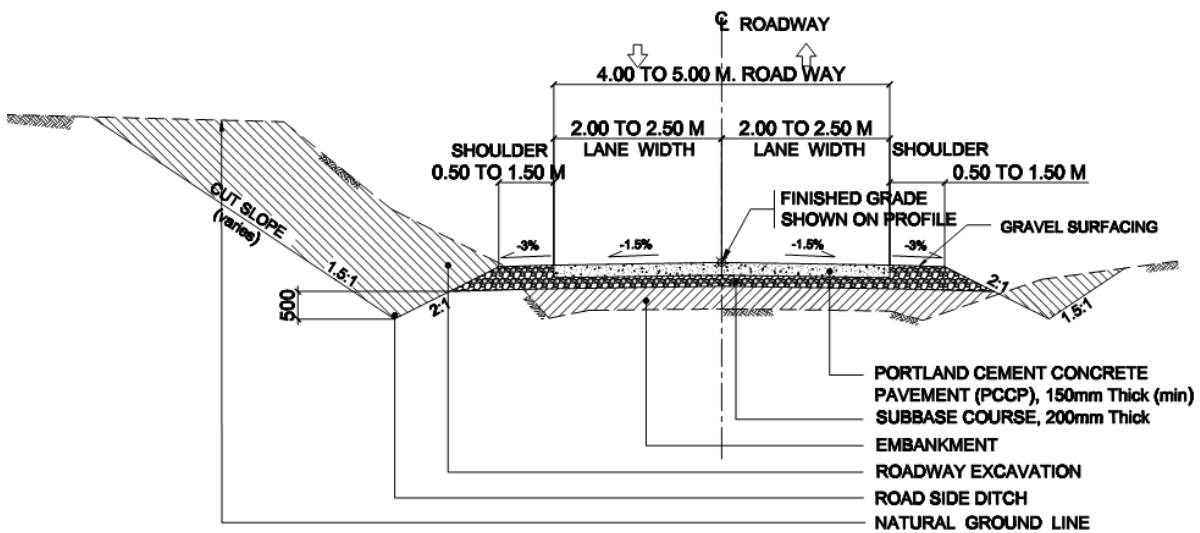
TYPICAL ROADWAY CROSS-SECTION FOR EXISTING ROADS
